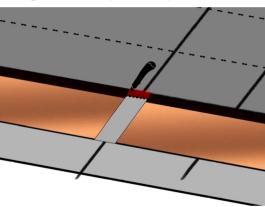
Cutting the upper part of the Compact Strip protective film
